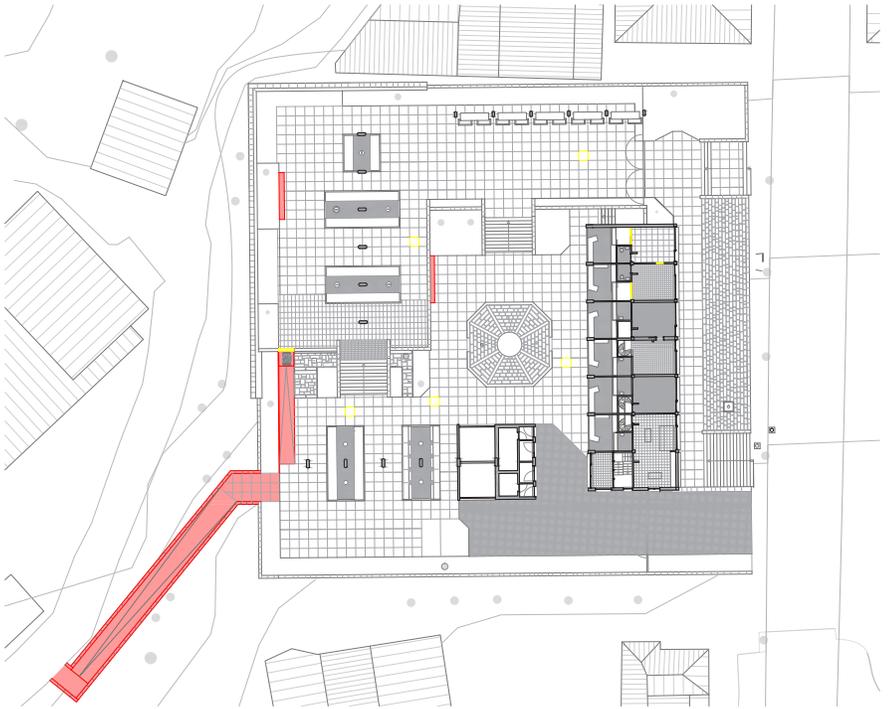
Plan of the Market including feasible new link with surrounding buildings (drawing by Fernando Jorge Pereira Veiga Junior).
